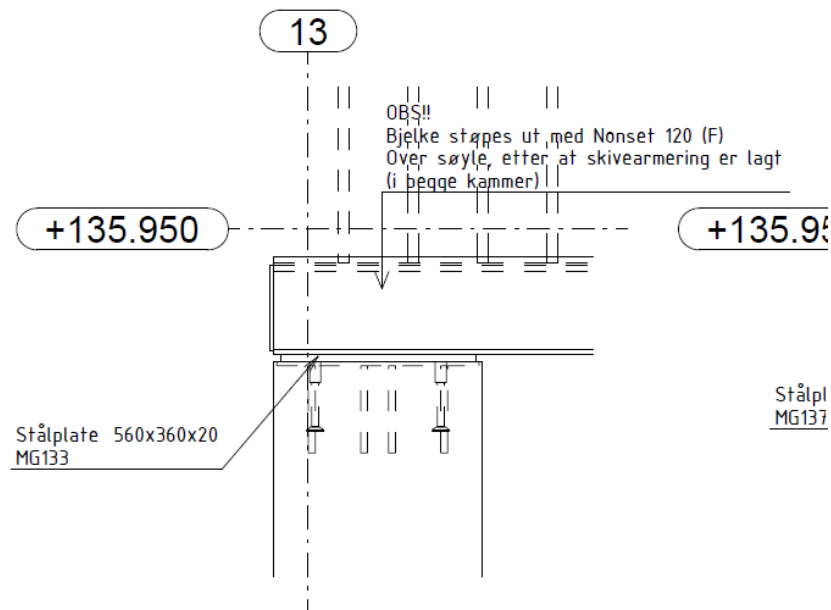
Concrete column - steel beam connection provided by the consulting company Core Technology
